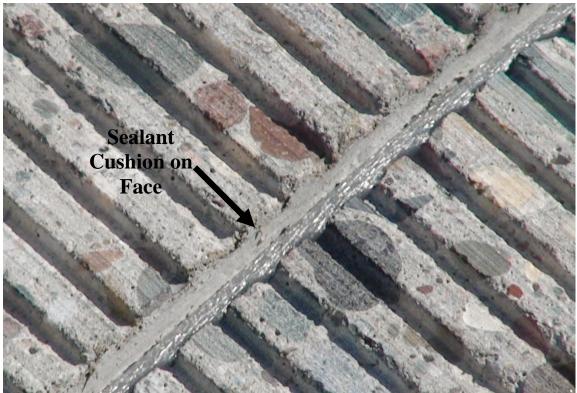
Photo of Sealant Reservoir in NGCS Section with Silicone still on Sidewalls
